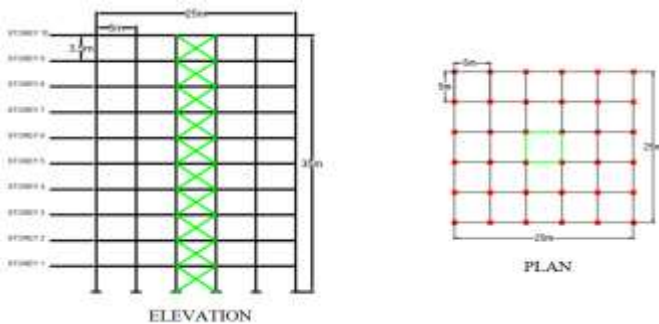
MODEL-C1 REGULAR FLAT SLAB BUILDING WITH BRACINGS
